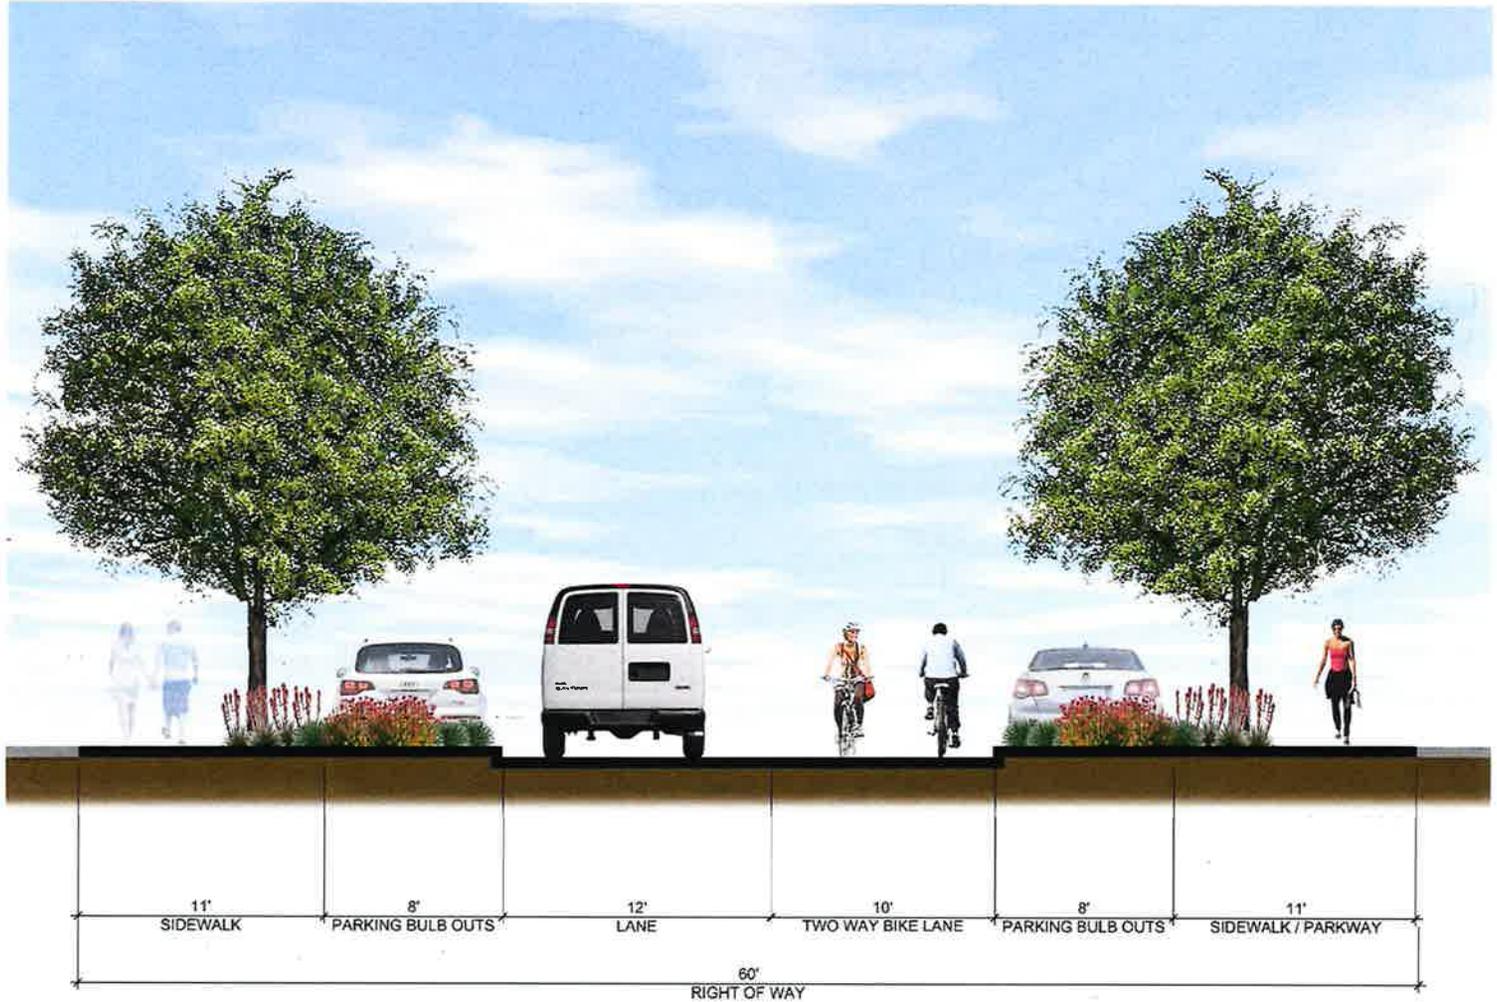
Bradford Avenue Looking Southbound from Center Street Cross Section
